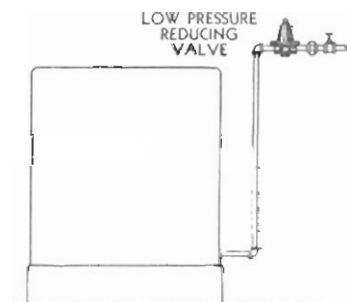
Method of installing Low Pressure Reducing Valve on hot water boiler.
